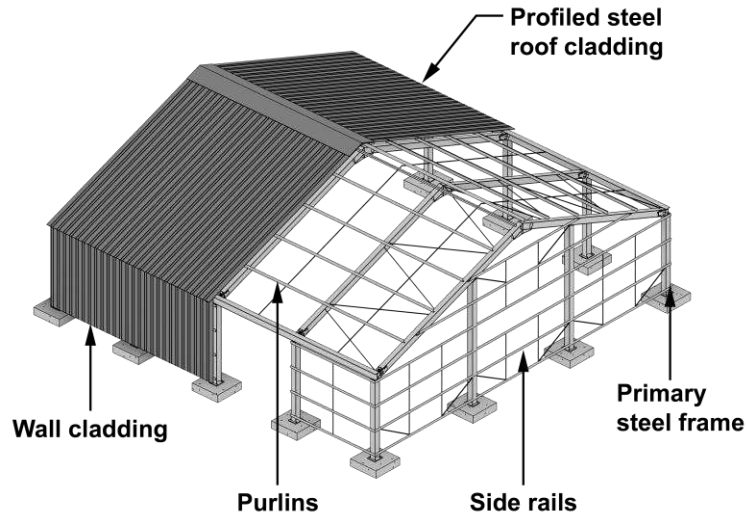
Schematic illustration of an SLF building (Figure adapted from FEMA 547, FEMA, 2006)
